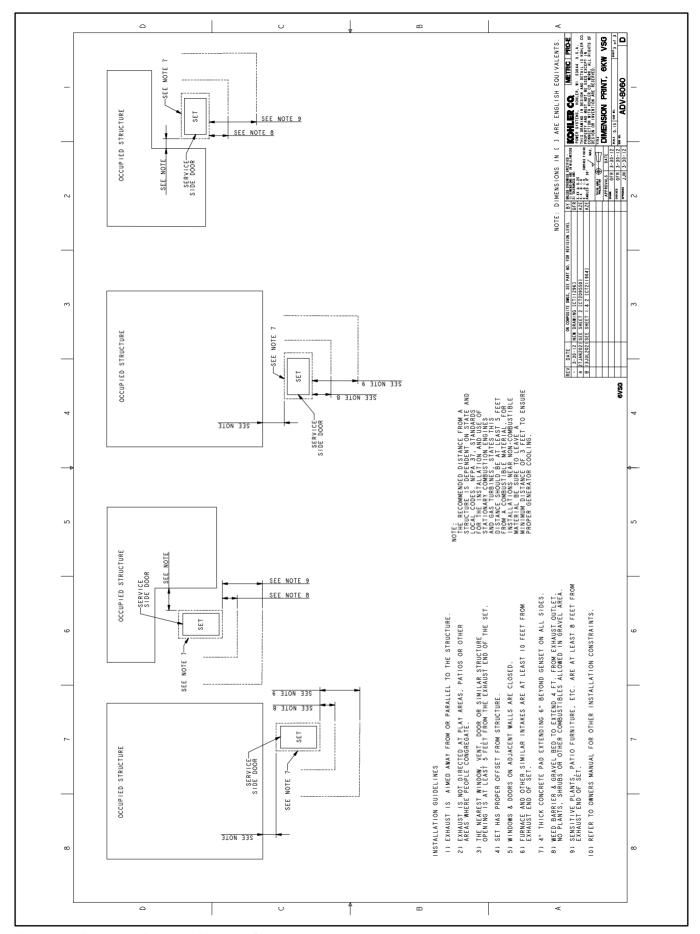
Dimension Drawing ADV-8060, Sheet 3
